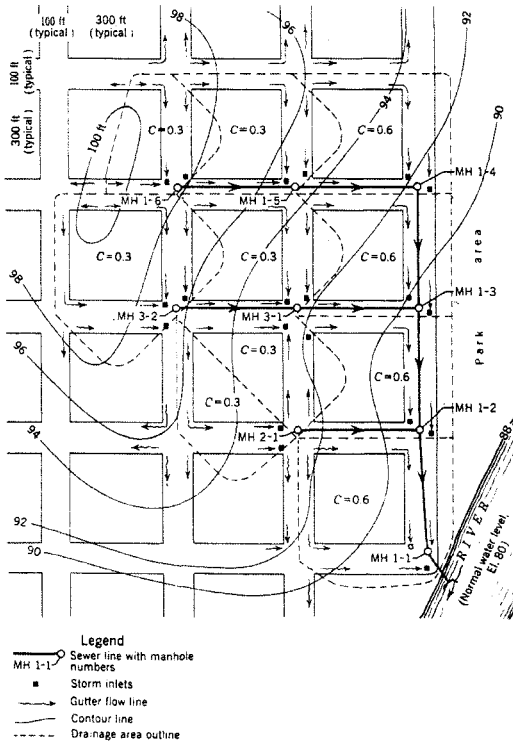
Typical Storm Sewer Design Plan (ASCE Manual No. 37, Figure 11-12, p. 51)
